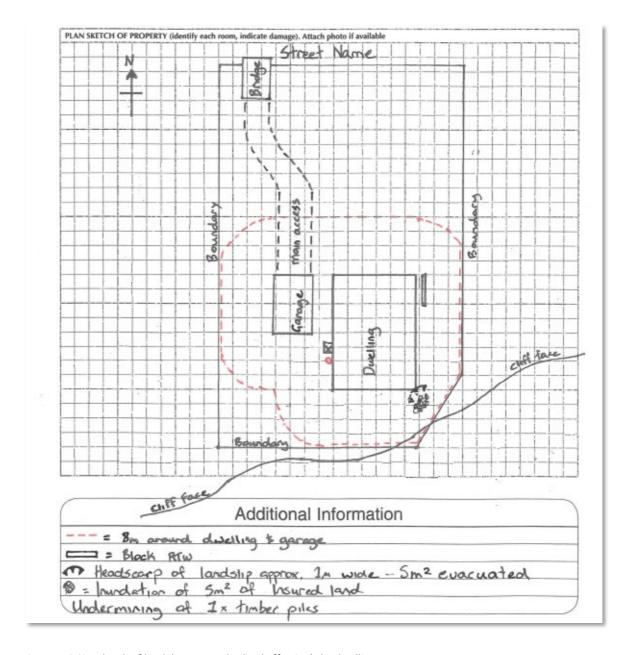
Site sketch of land damage under (and affecting) the dwelling
